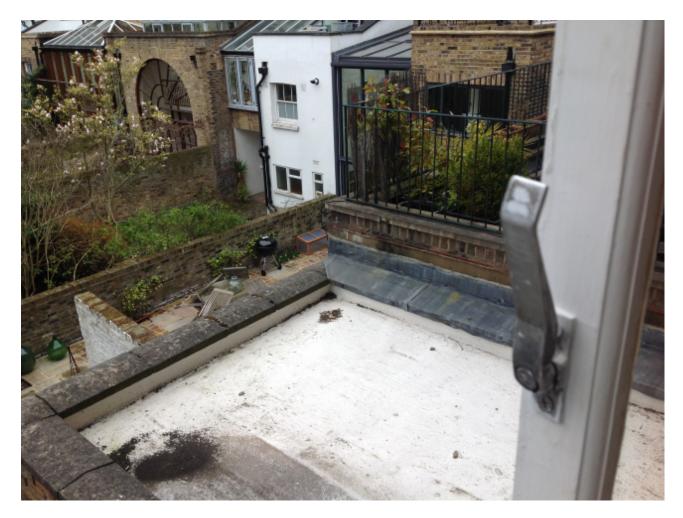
View of existing flat roof of no. 44 Chalcot Road from first floor kitchen
